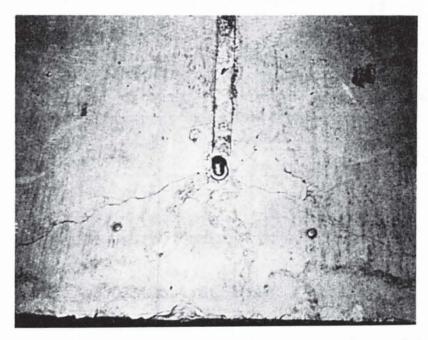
Steel failure preceded by concrete crushing in front of the anchor
